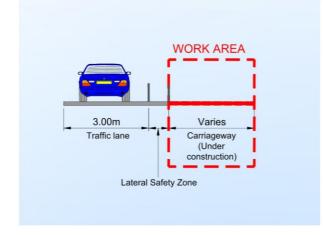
Traffic Management Cross Section, Section 2a – Stage 2a
